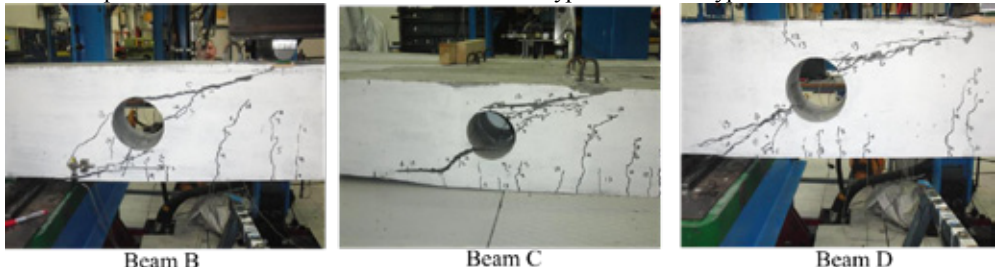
Crack pattern after failure for the RC beams with single openings.
